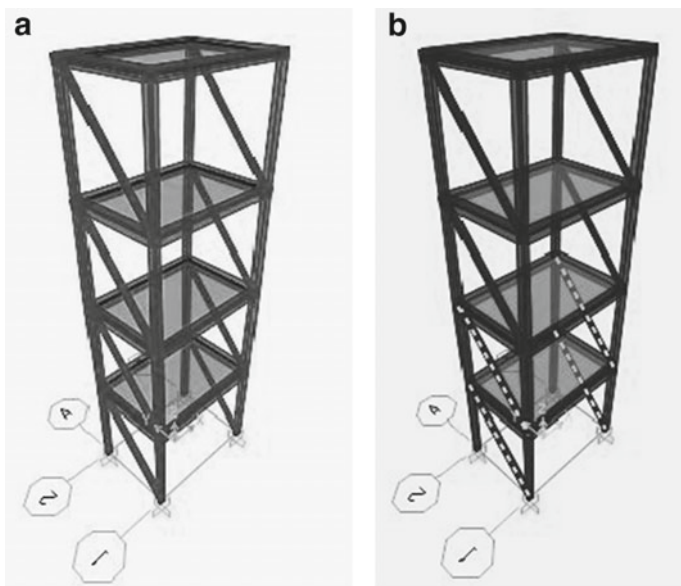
Damage patterns a Undamaged case. b Damage on first floor and second floor (12F)
